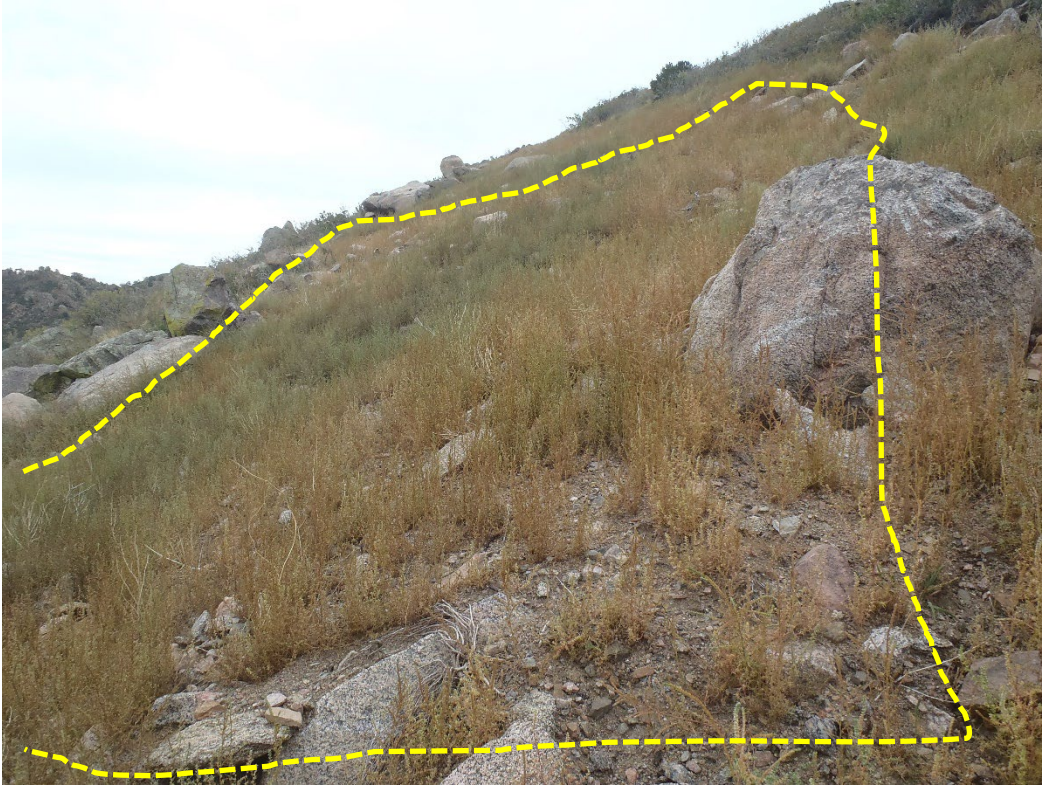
Backfilled Windy Point access Road C.1 (looking SE from approx. BLM boundary line, Note R. thistle).
